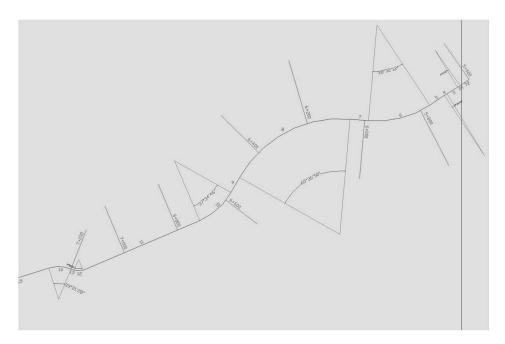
Detail of the horizontal alignment of the downstream half reach (1)
